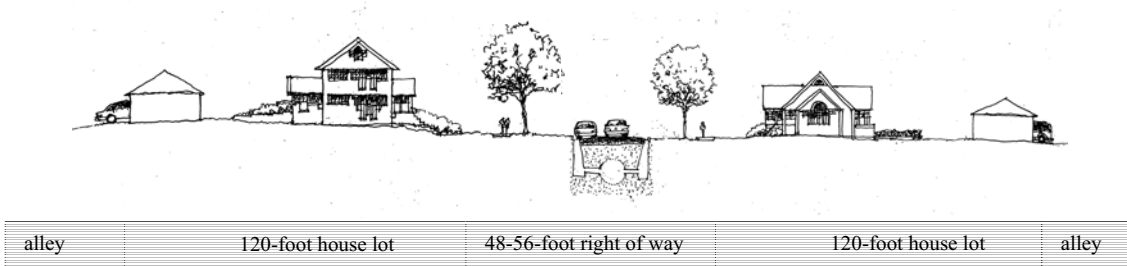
Local/Residential Street—Leaky Pipe with Curb and Gutter
